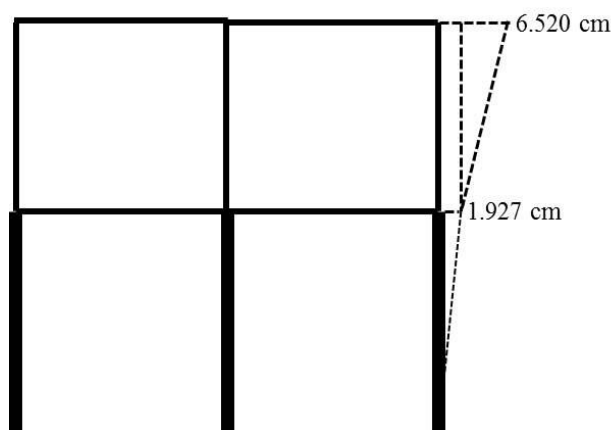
Sway mode due to earthquake load acting on the frame structure of coconut-timber house
